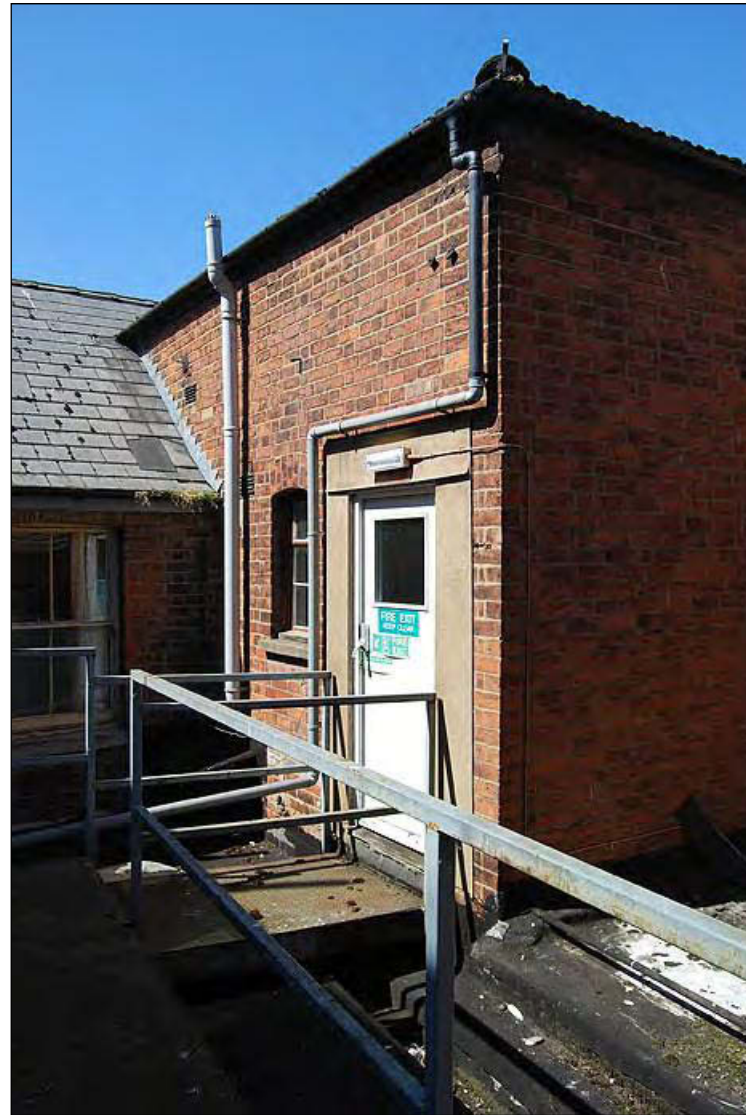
South and East elevation of fire exit wall, adjoining room 31
